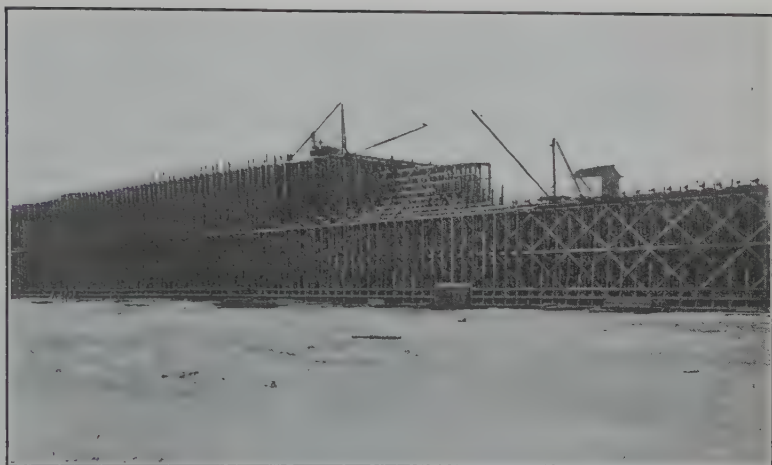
ORE DOCK NO. 3 OF THE GREAT NORTHERN RAILWAY, UNDER CONSTRUCTION.
